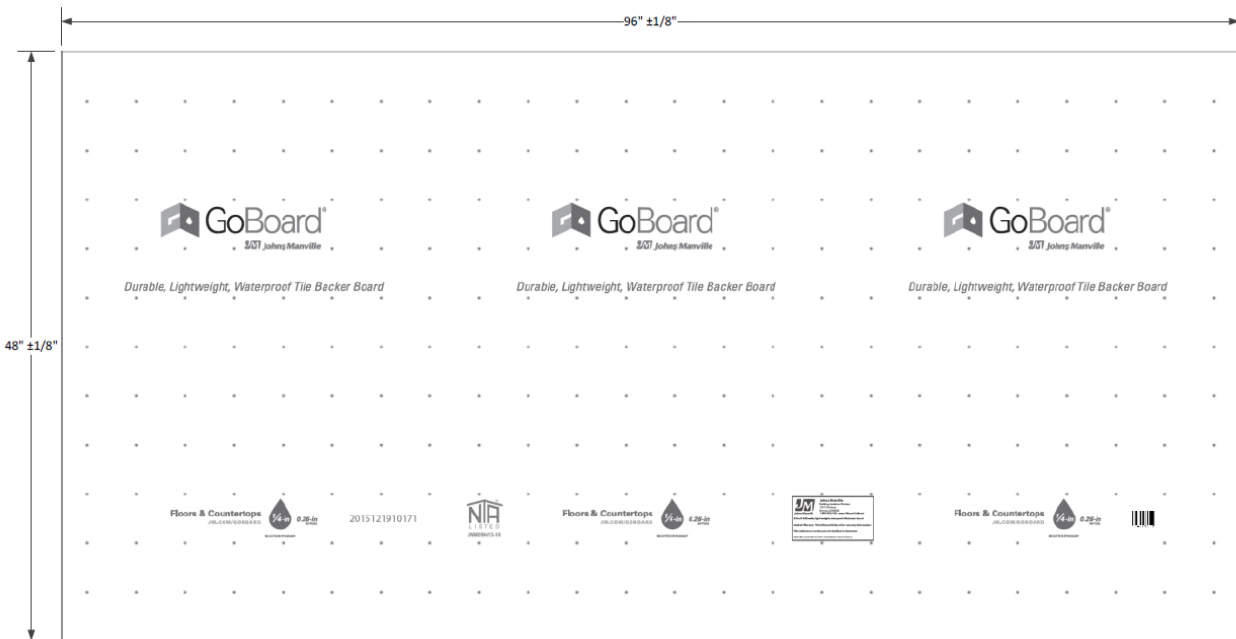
GoBoard® 48-in. x 96-in. Sheet Dimensions
